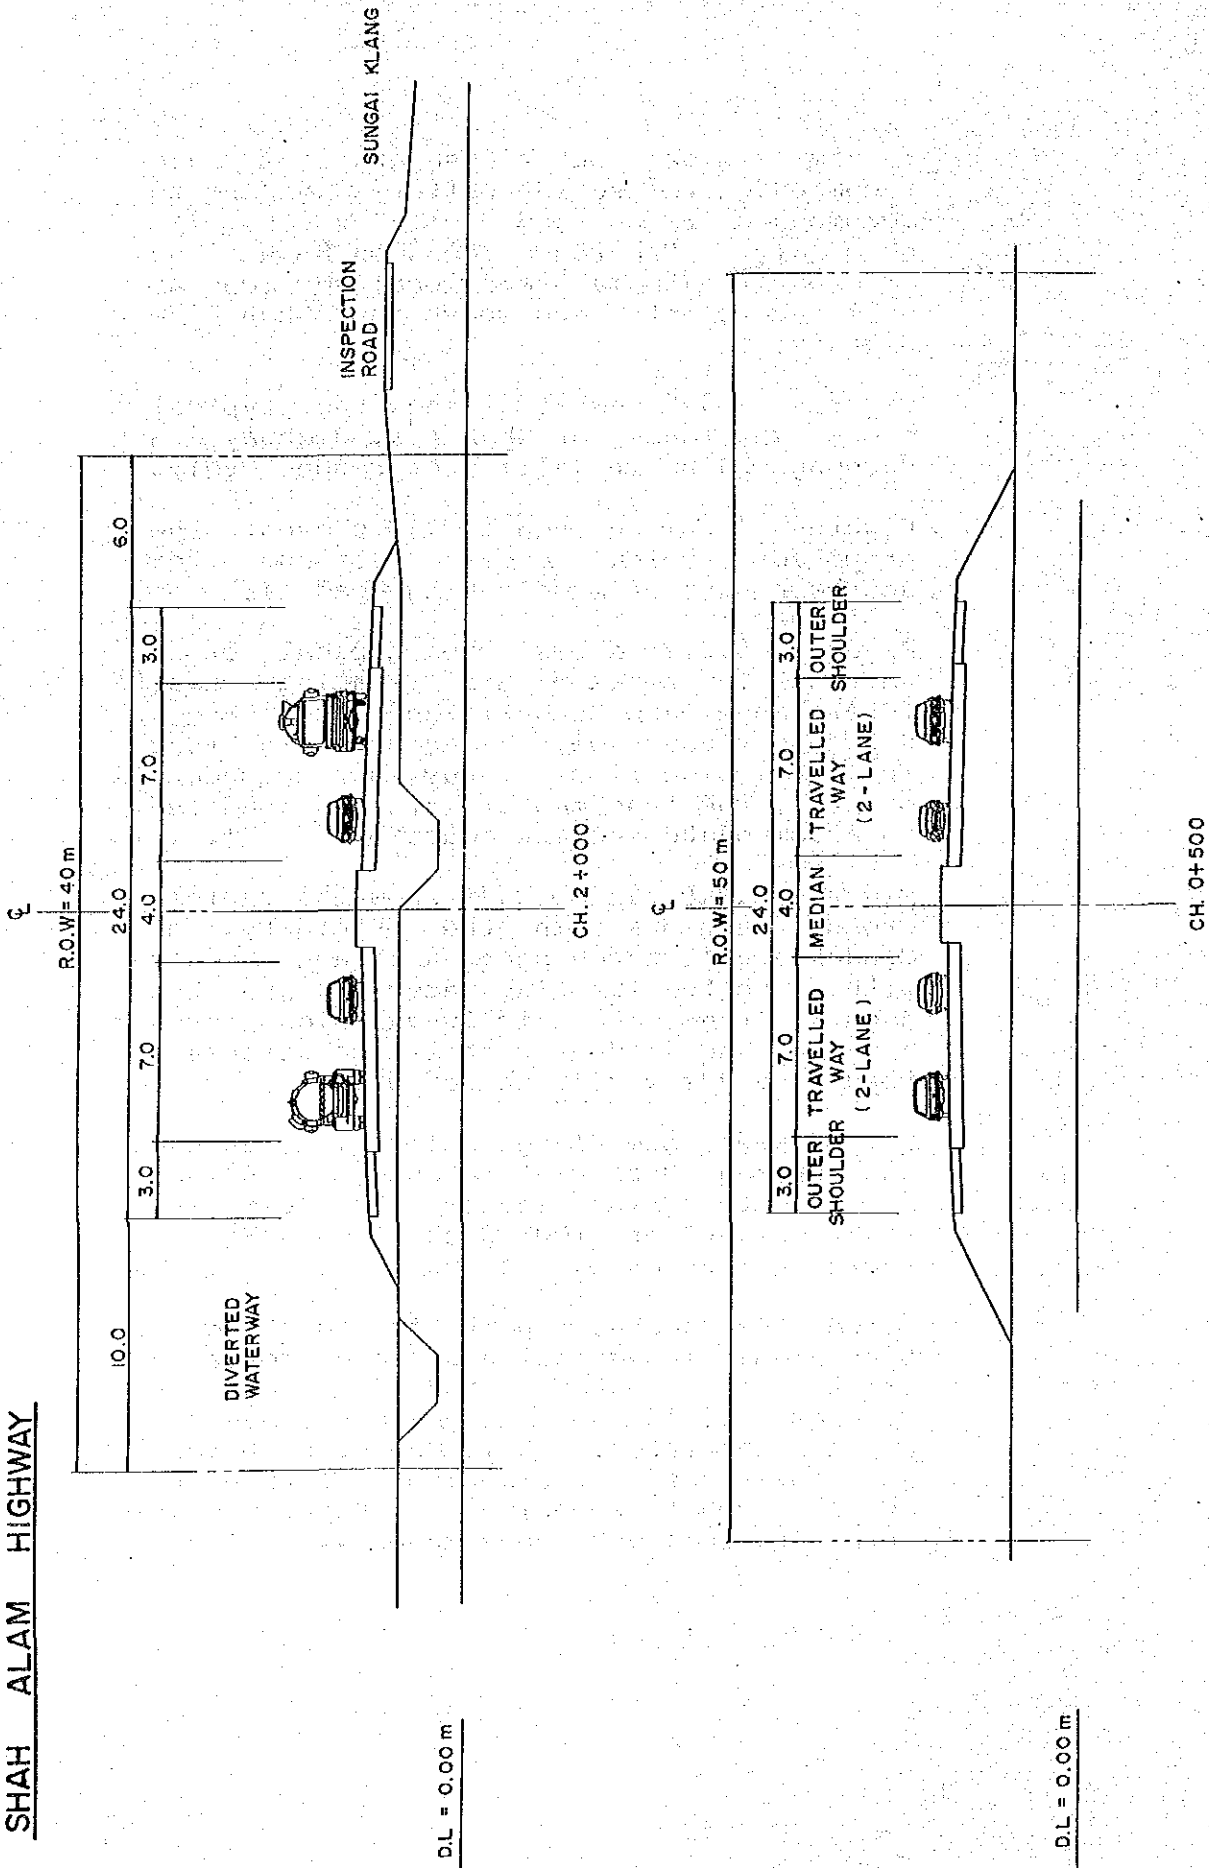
TYPICAL CROSS-SECTION FOR 4-LANE ROAD IN KLANG AREA
